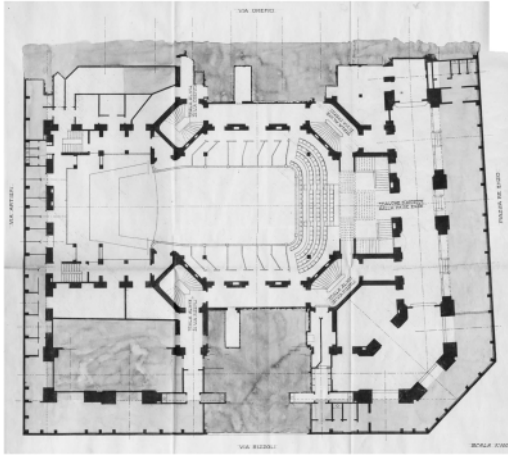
Plan of the first underground floor of Palazzo Ronzani (private collection).
